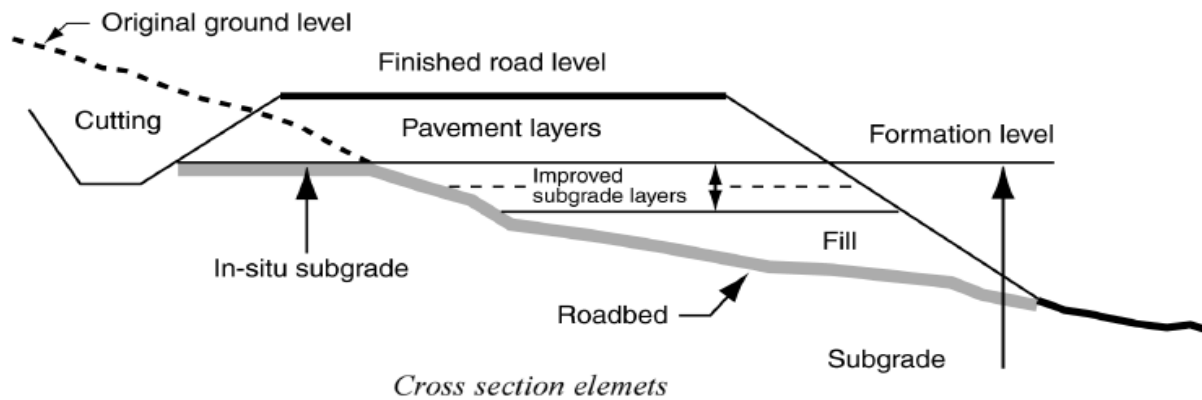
Pavement Typical Detail (Tanzanian Pavement Manual, 2000)
